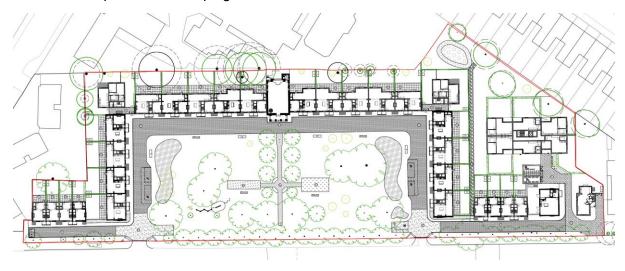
View of Existing structure in relation to proposal Apartment building.
